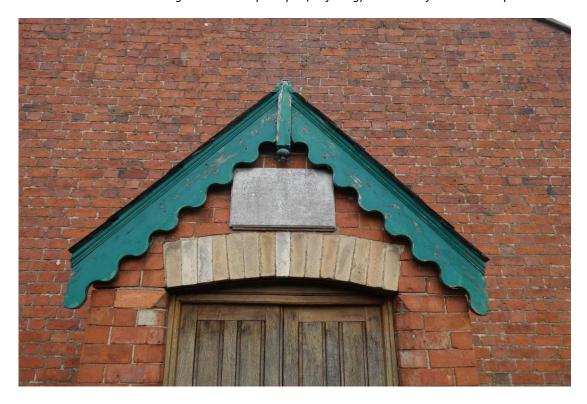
View looking NW showing detail of memorial tablet (1946) and wavy bargeboarding over entrance porch to chapel
